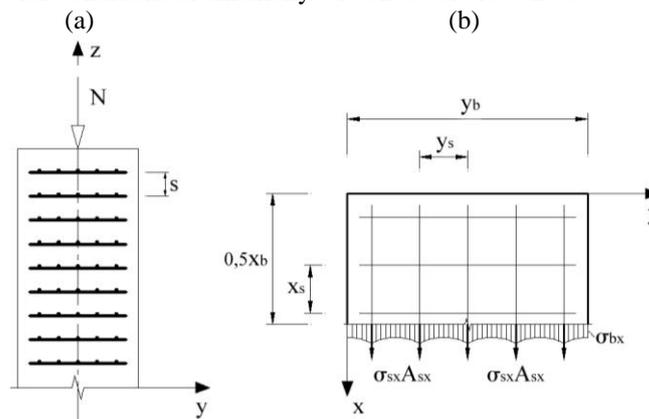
Concrete element with mesh reinforcement: a – side view; б – scheme of forces in the studied fragment.
